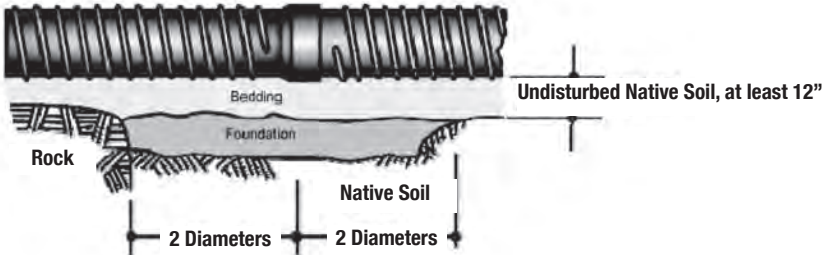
Proper Transition from Rock Trench Bottom to Normal Trench Support
